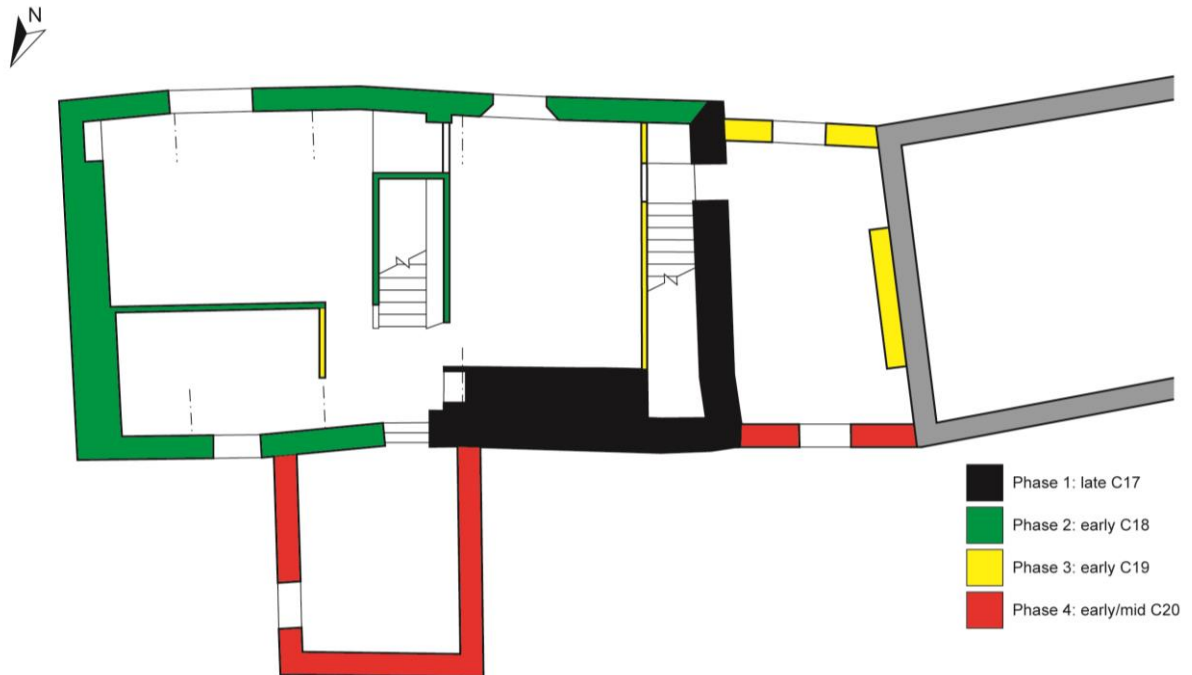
PROVISIONAL PHASED FIRST-FLOOR PLANS.
